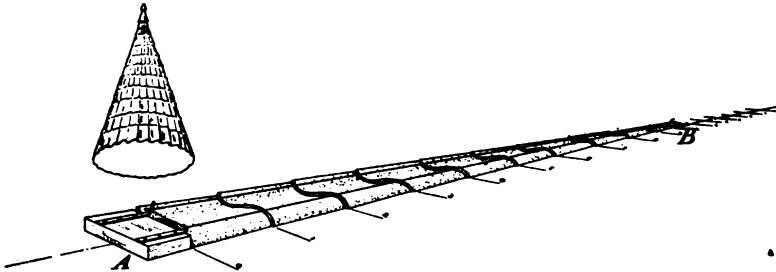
Perspective View of Method of Laying Out Tower Tiles.
